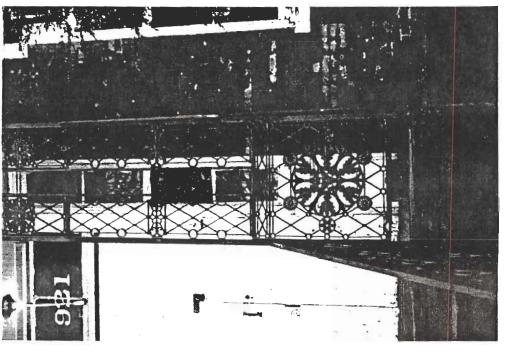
North Entrance Portico Cast Iron Railing and Stone Stair Detail.
